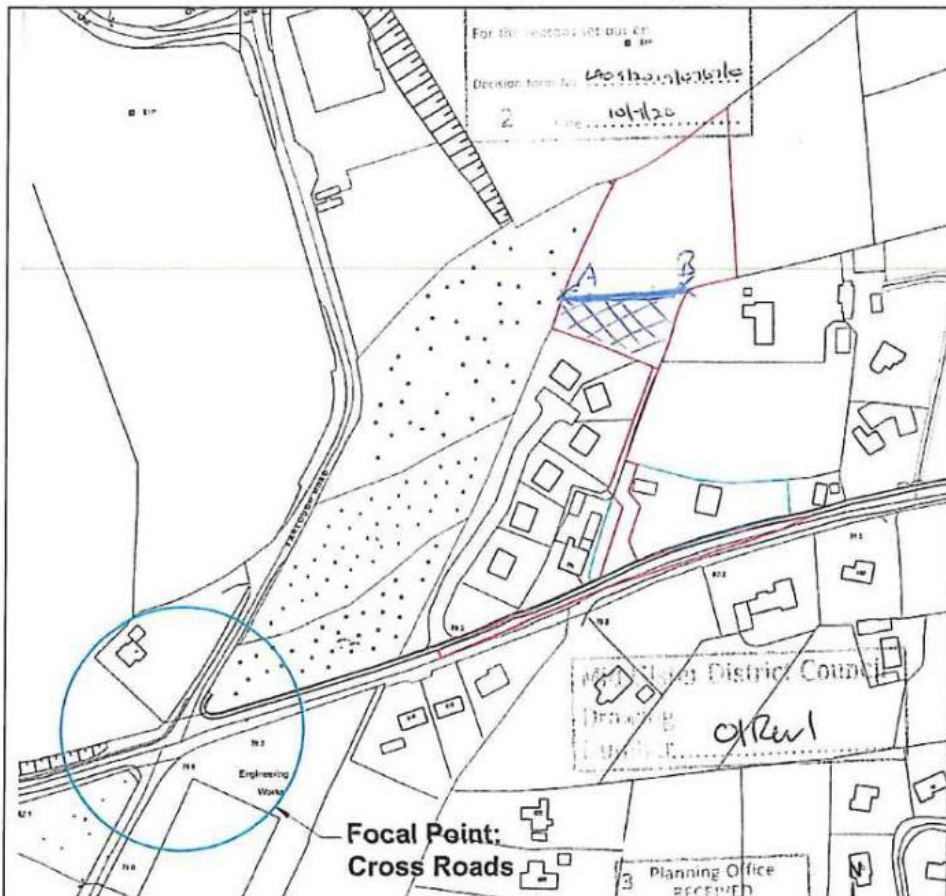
Screenshot of the stamped approved site location plan from LA09/2019/0767/O
